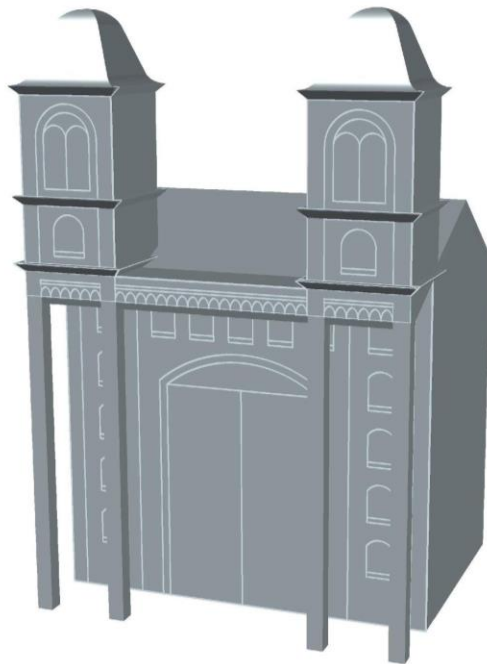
3D CAD Façade Drawing of the North Grosvenordale Mill
